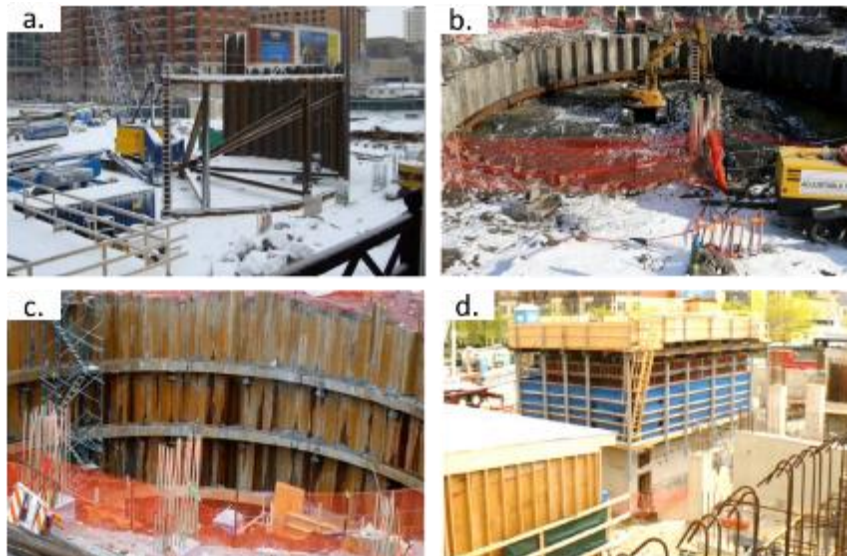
OMPW cofferdam construction sequence. Picture (a.) shows the sheet pile driving process. Picture (b.) shows the excavation from the first metallic bracing to the following. Picture (c.) shows the third metallic bracing installed and the excavation process. Picture (d.) shows the central core and basement slabs construction when cofferdam's work was done. After (Arboleda-Monsalve 2014).
